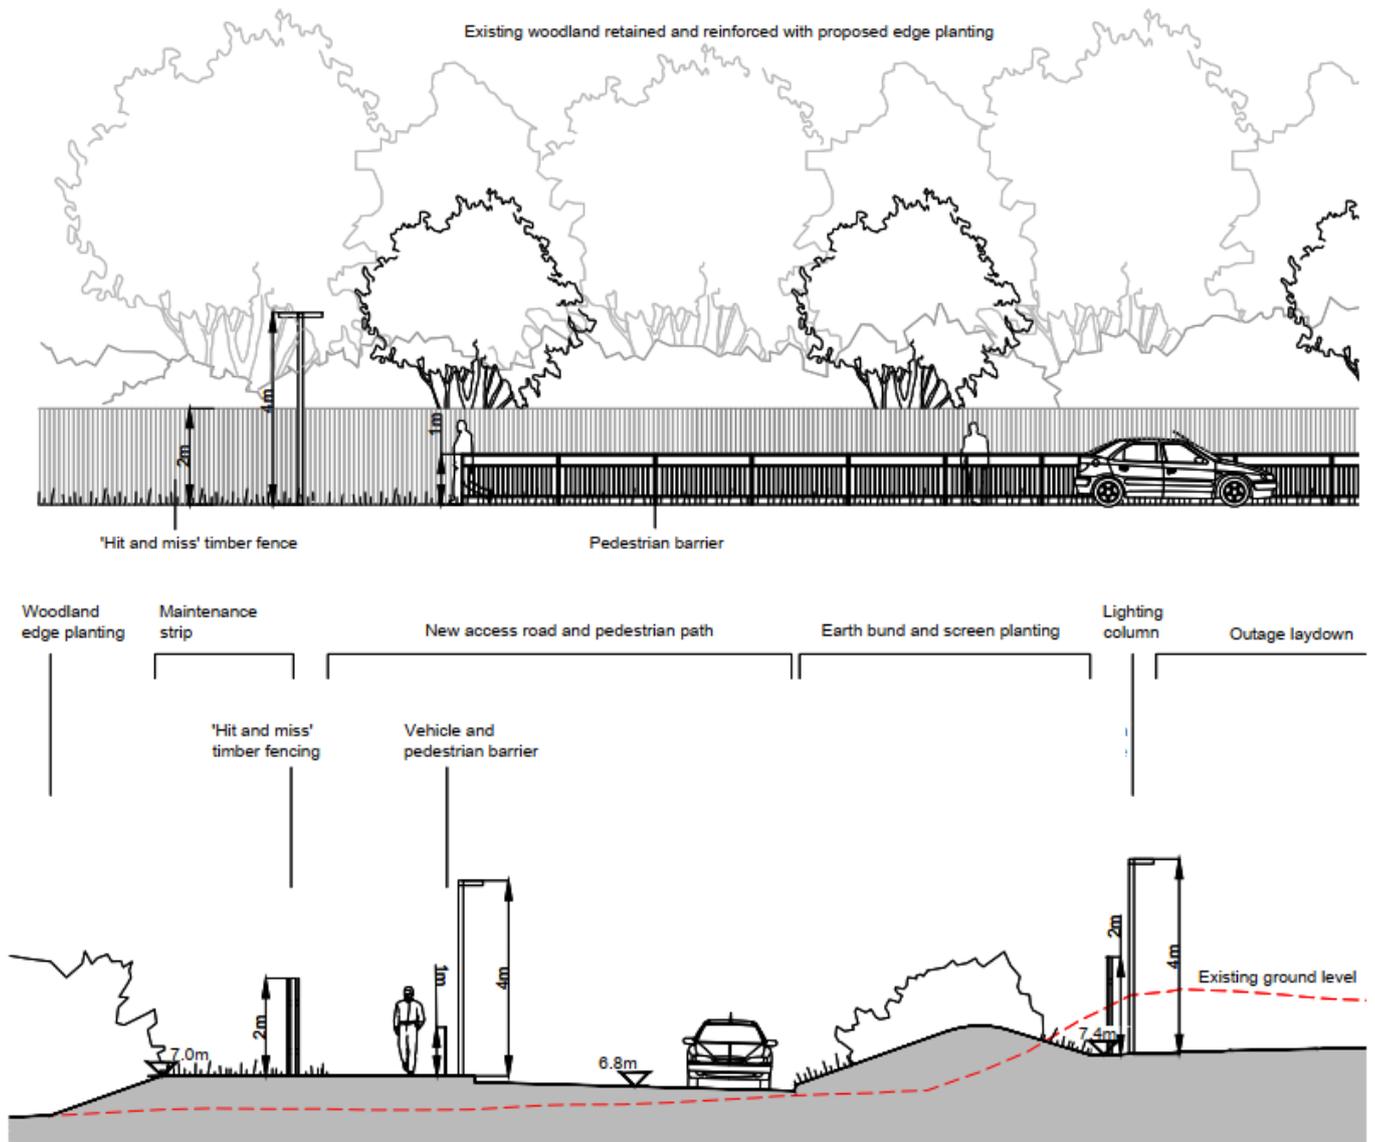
Elevation and Section of Proposed Coronation Wood Design in Vicinity of the Western Access Road
